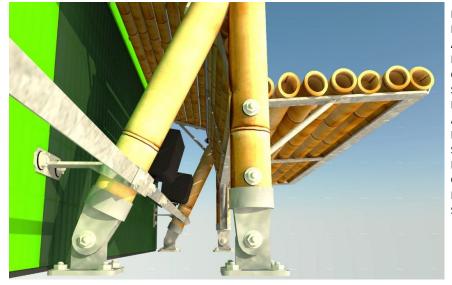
Detail for Fixed Bench Frame Attached to Main Frame. Center Speakers Support Beam Behind with GMS Attachment Detail to Main Frame Back Support Legs. Main Bamboo Frame GMS Fixing Point to Paving. Side View.
